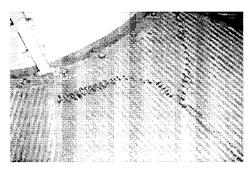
Repair made by metal stitching, floor plate Lighthouse Den Helder.
